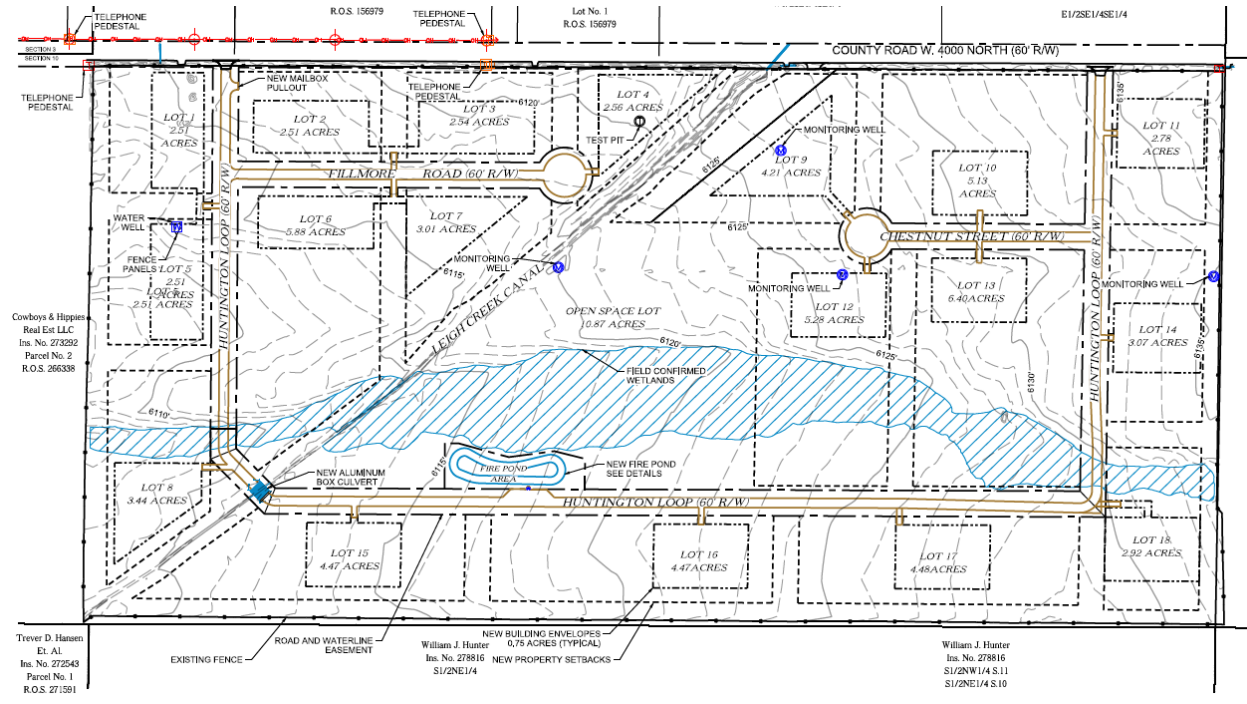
Approved Preliminary Plat (full image from improvement plans)
